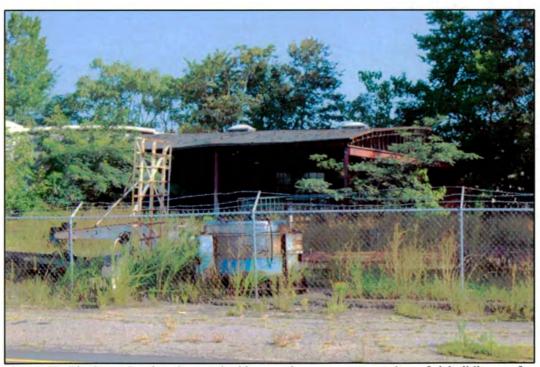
Pit Crew Service Center: looking northwest at open arch-roofed building at far right of building complex; note east-facing arch of eastern building peeking above heavy overgrowth at left
